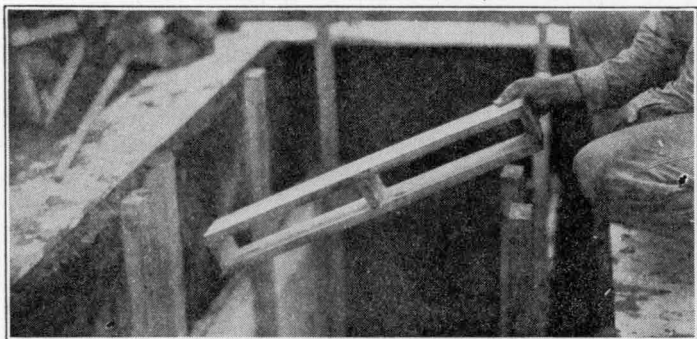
WHEN CONCRETE IS 2 FEET 2 INCHES ABOVE FLOOR,
